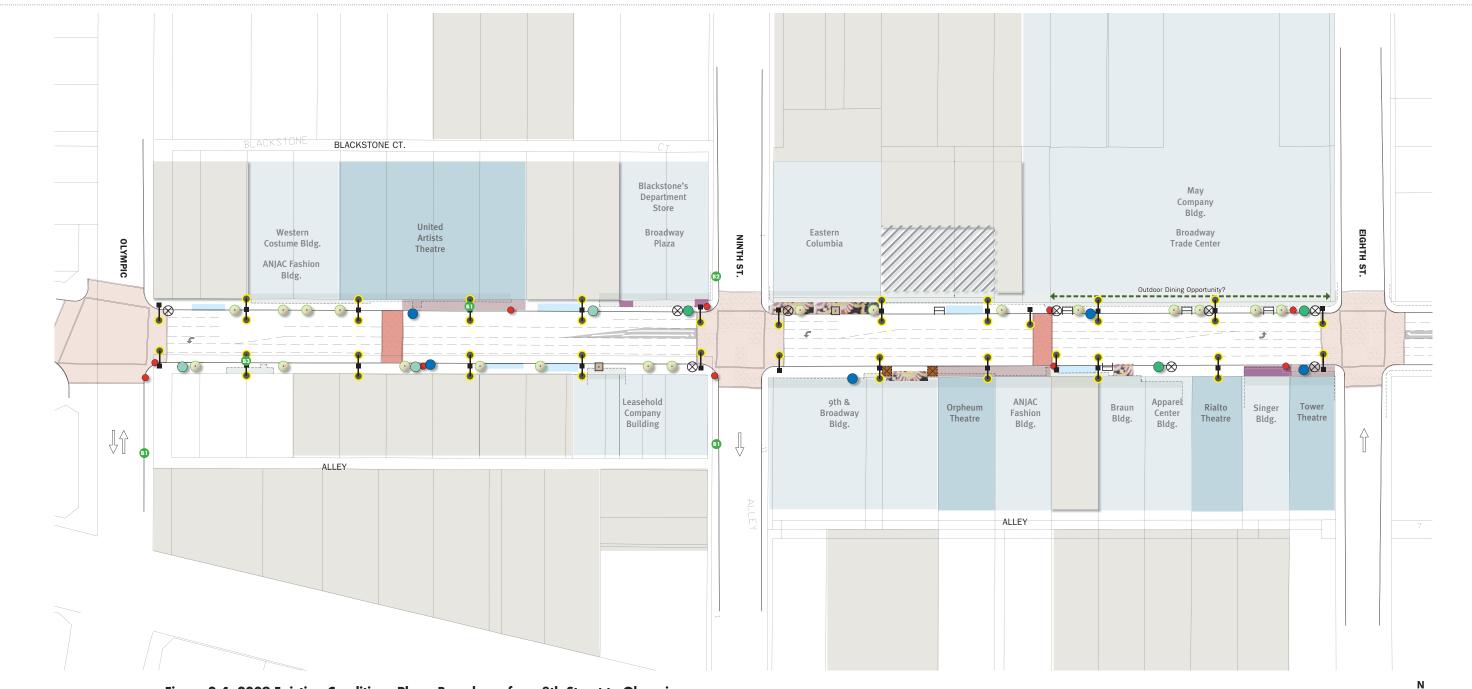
2009 Existing Conditions Plan - Broadway from 8th Street to Olympic
